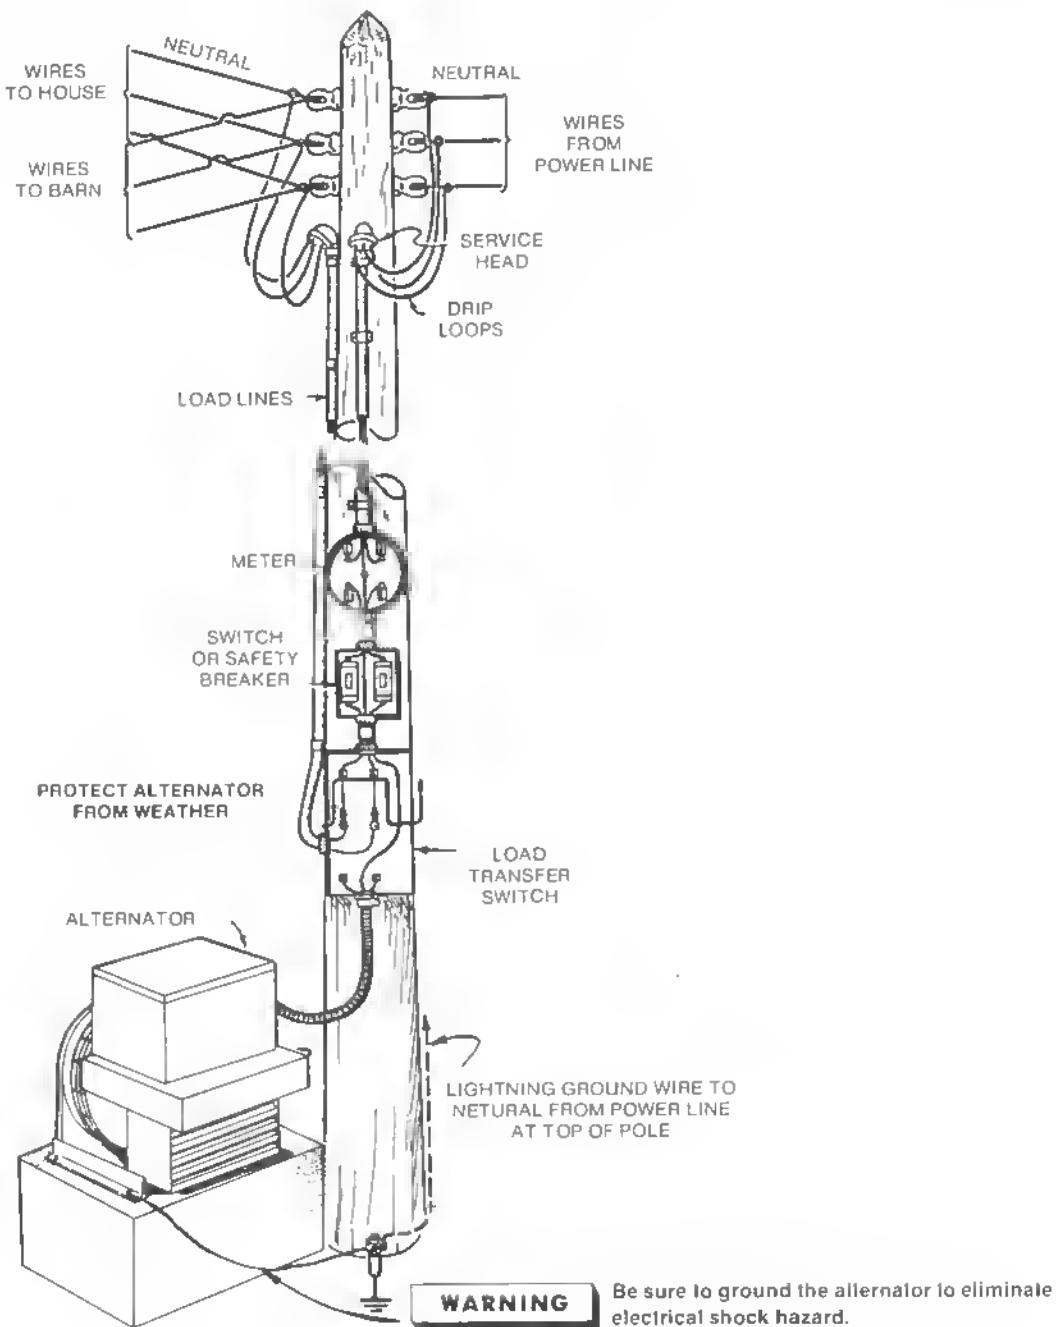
TYPICAL SINGLE-PHASE ALTERNATOR INSTALLATION
